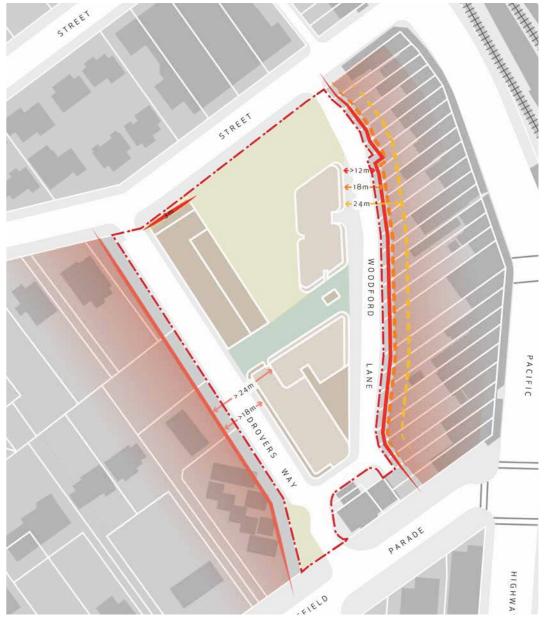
Indicative Design - Building Footprint & Setbacks Plan
